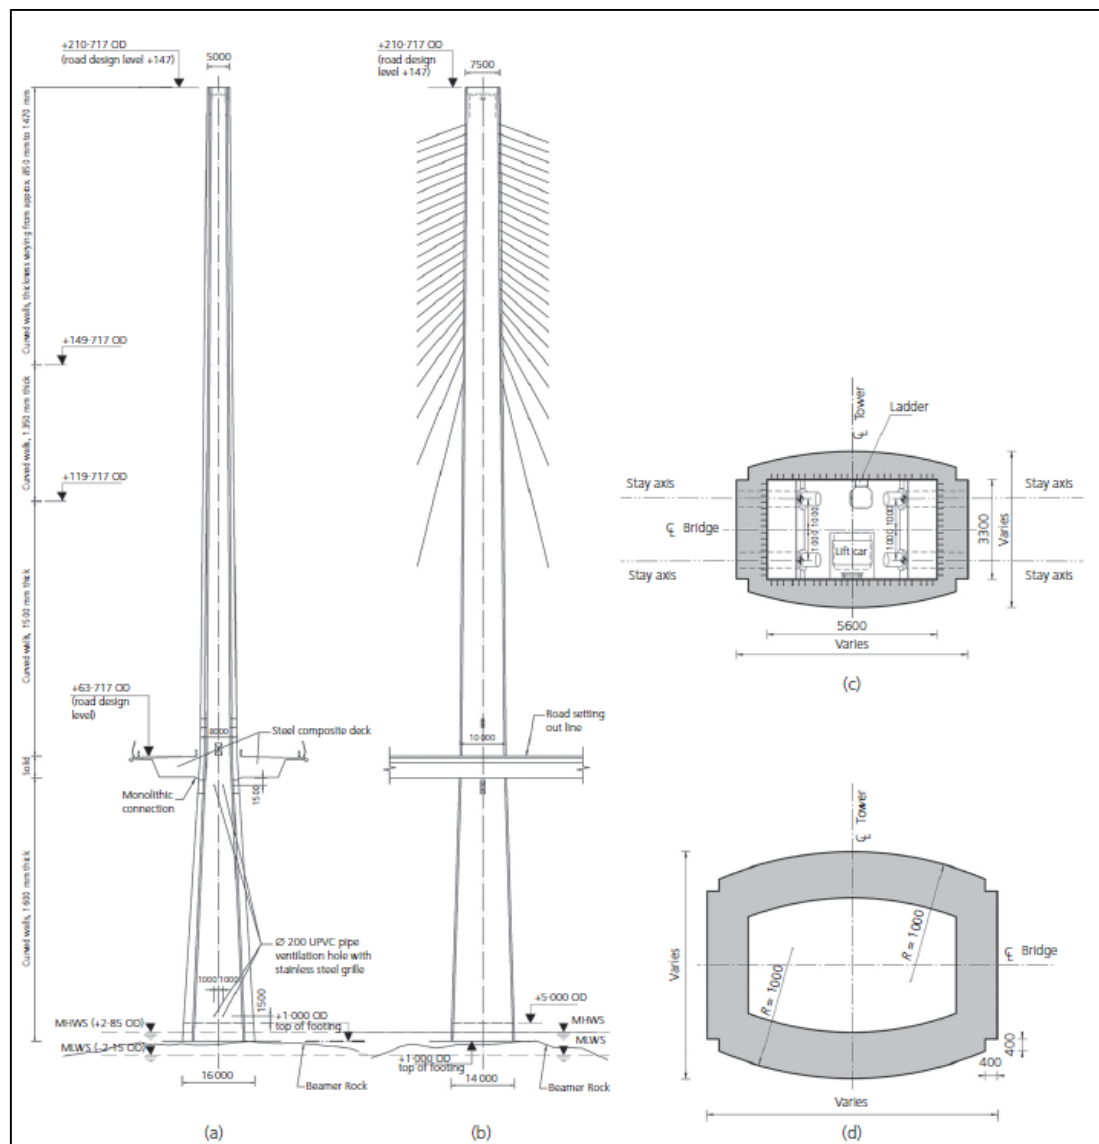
CT elevations and sections: (a) front elevation; (b) side elevation; (c) section at tower head
